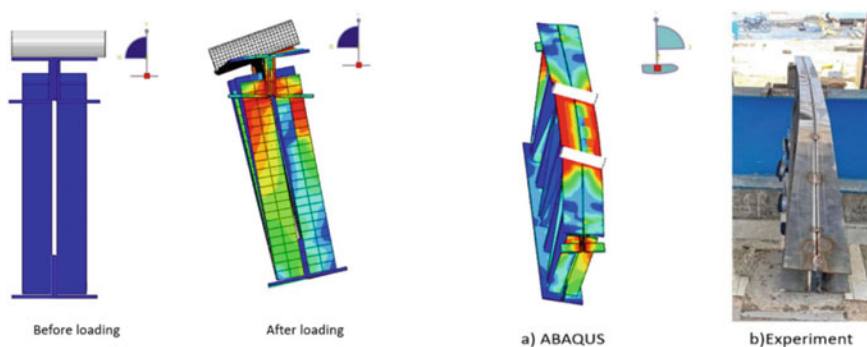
Failure due to lateral torsional buckling of (AI-ISJ) Joist arrangement four I-section steel joist
